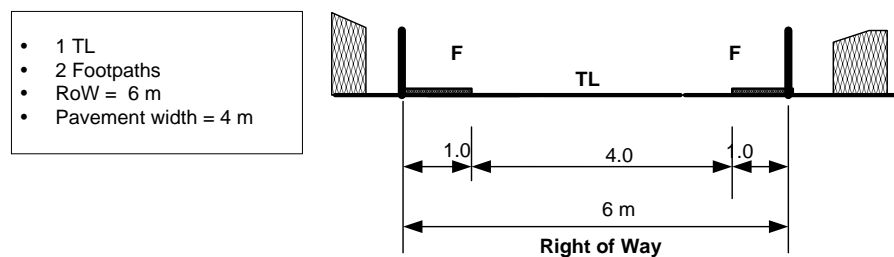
, Typical Cross section of Class D Roads (RoW 6 m)
